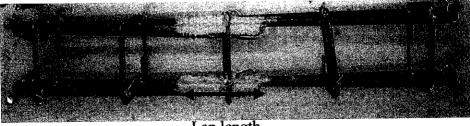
&b: Steel reinforcement detailing for beam samples
